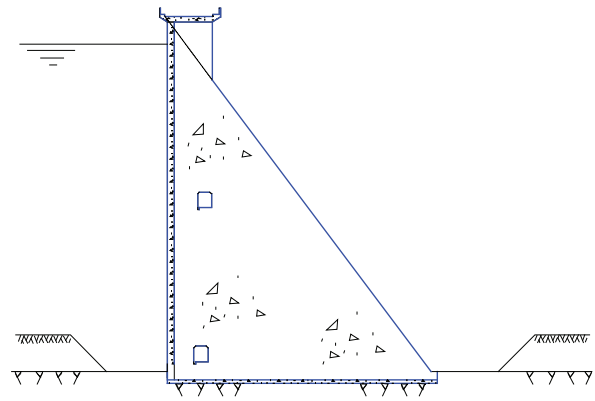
Typical cross-section of a roller compacted concrete dam.
